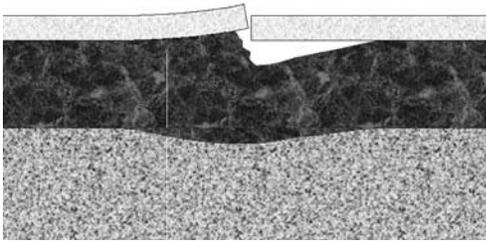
Transverse joint faulting mechanism in ALF UTW slabs.
